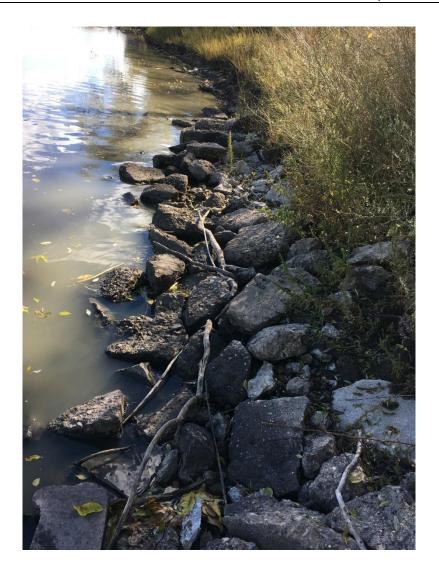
North Drive outfall site showing shoreline around the outfall (photo taken looking upstream).
